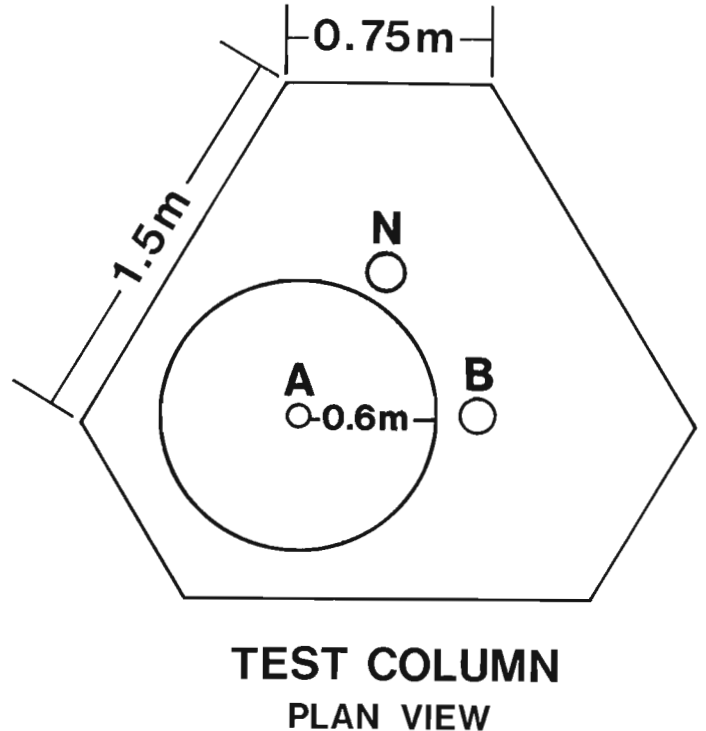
Plan view of a test column showing location and spacing of the three sizes of model boreholes.
